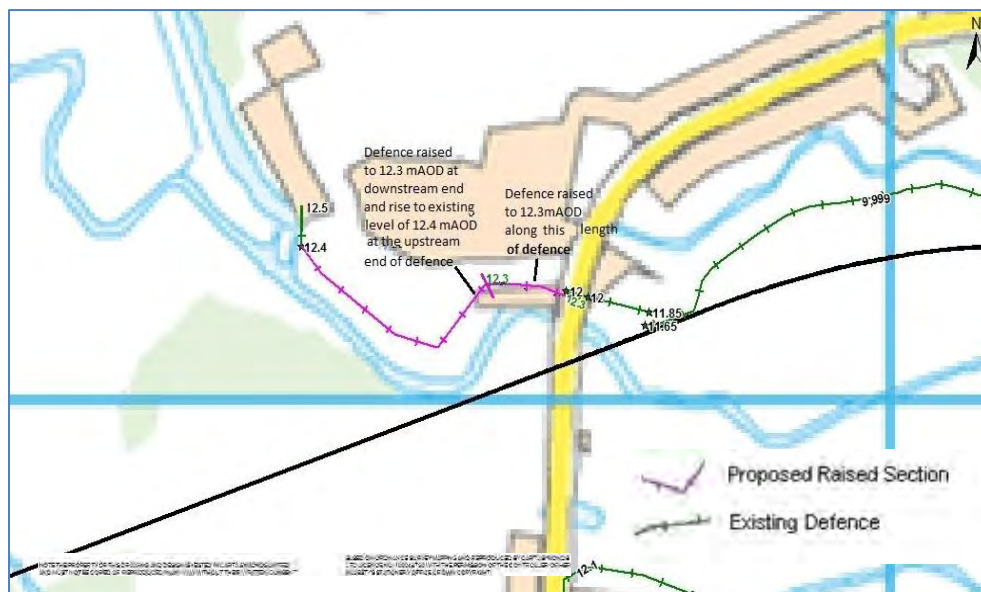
The locations at Northbridge Street where the raising the defences is proposed
